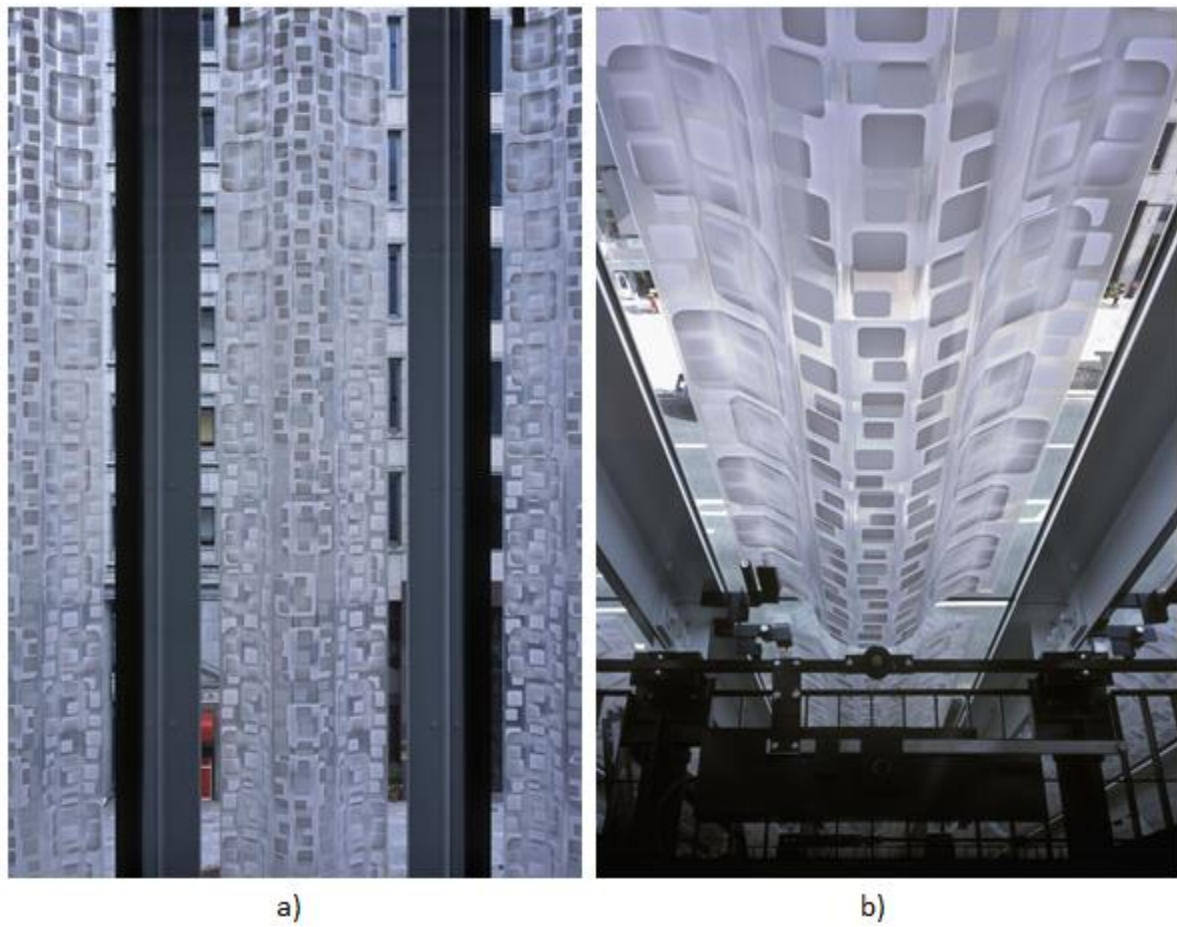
Rotating element: a) front view, b) upper view (Web A-15)
